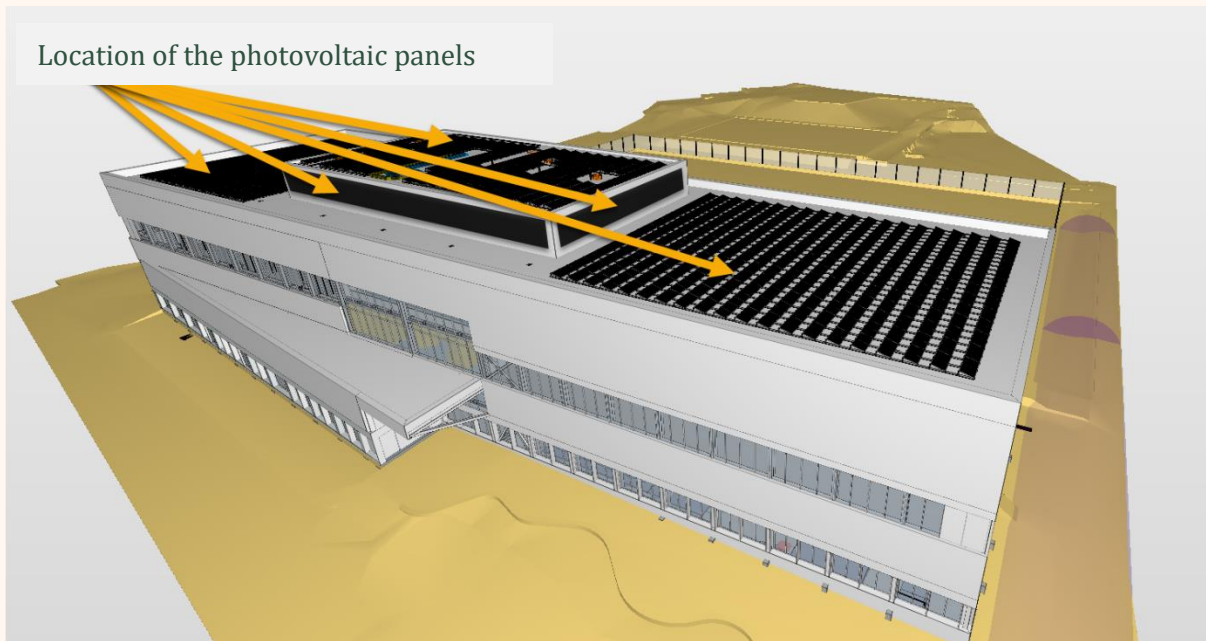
Scheme of the location of the photovoltaic panels on the sports hall. Source: Asplan Viak.
